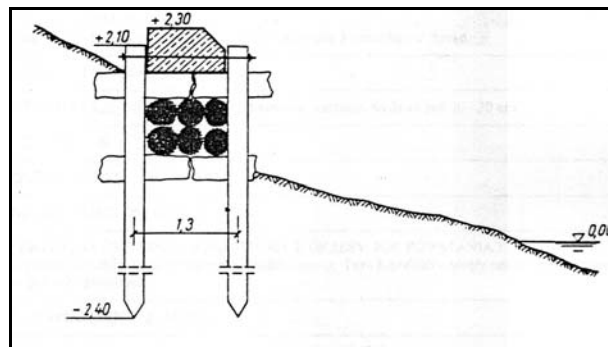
Typical cross section of the bulkhead filled with concrete blocks
